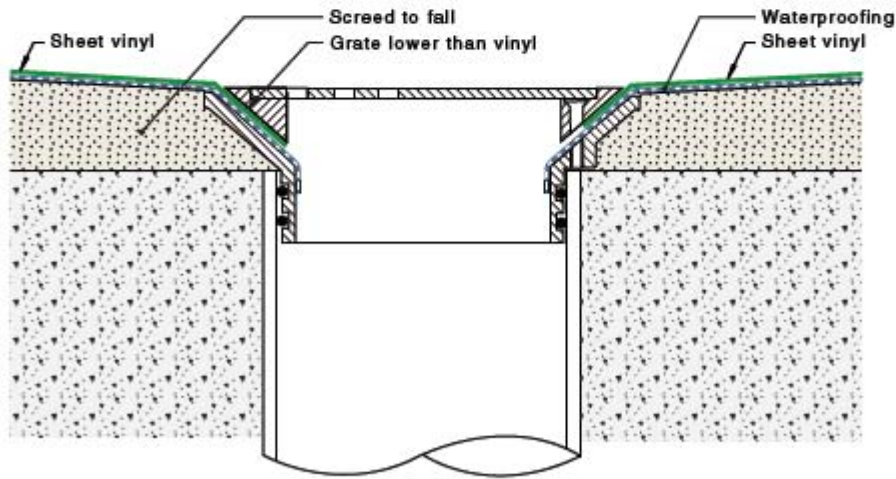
(C) — Vinyl installation — Push-in vinyl sheet waste
